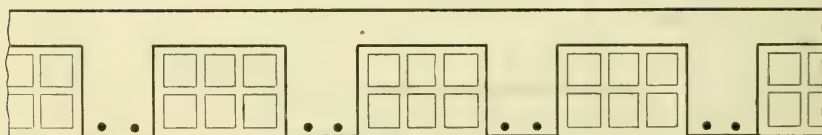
TYPICAL REINFORCED CONCRETE BEAM-AND-TILE CONSTRUCTION.
